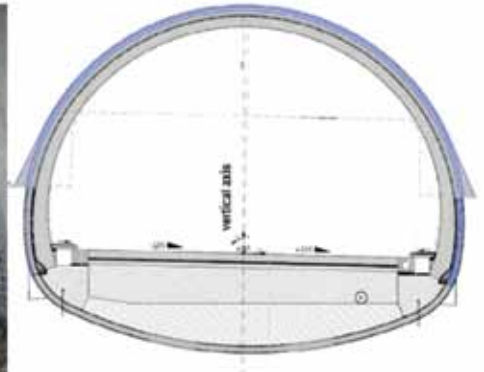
The final cross-section of right tunnel tube after reconstruction.
